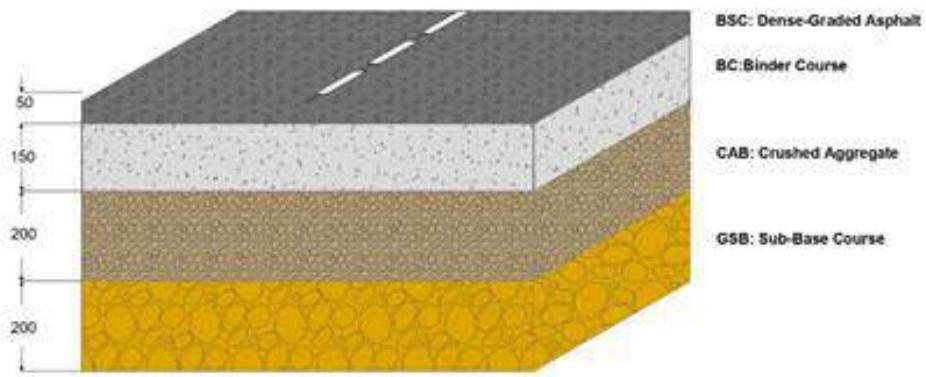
b) Pavement Structural Thickness Layout for T4
